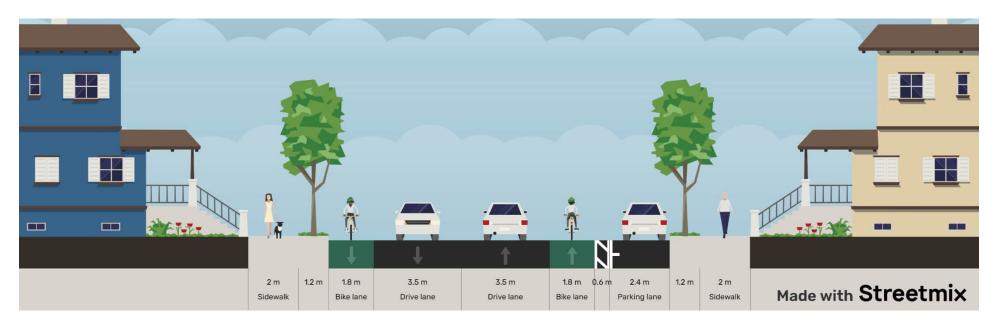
Collector (20 m Right-of-Way) On-Street Parking (One-Side) with Bike Lanes
